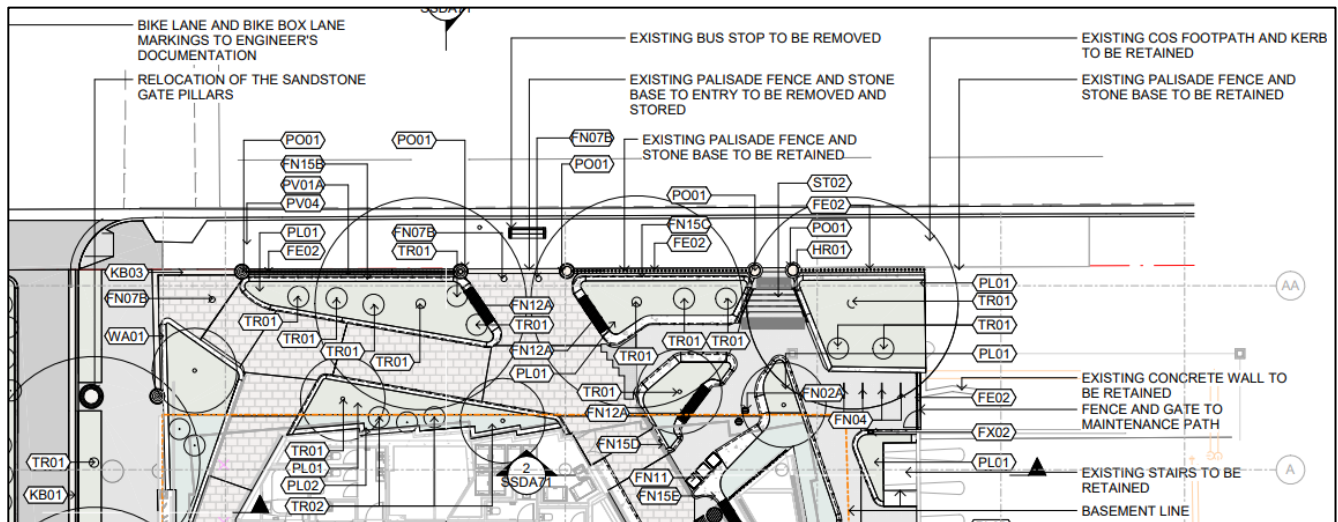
| Extract of amended landscape plan showing extent of front fence retention (Source: RtS)
